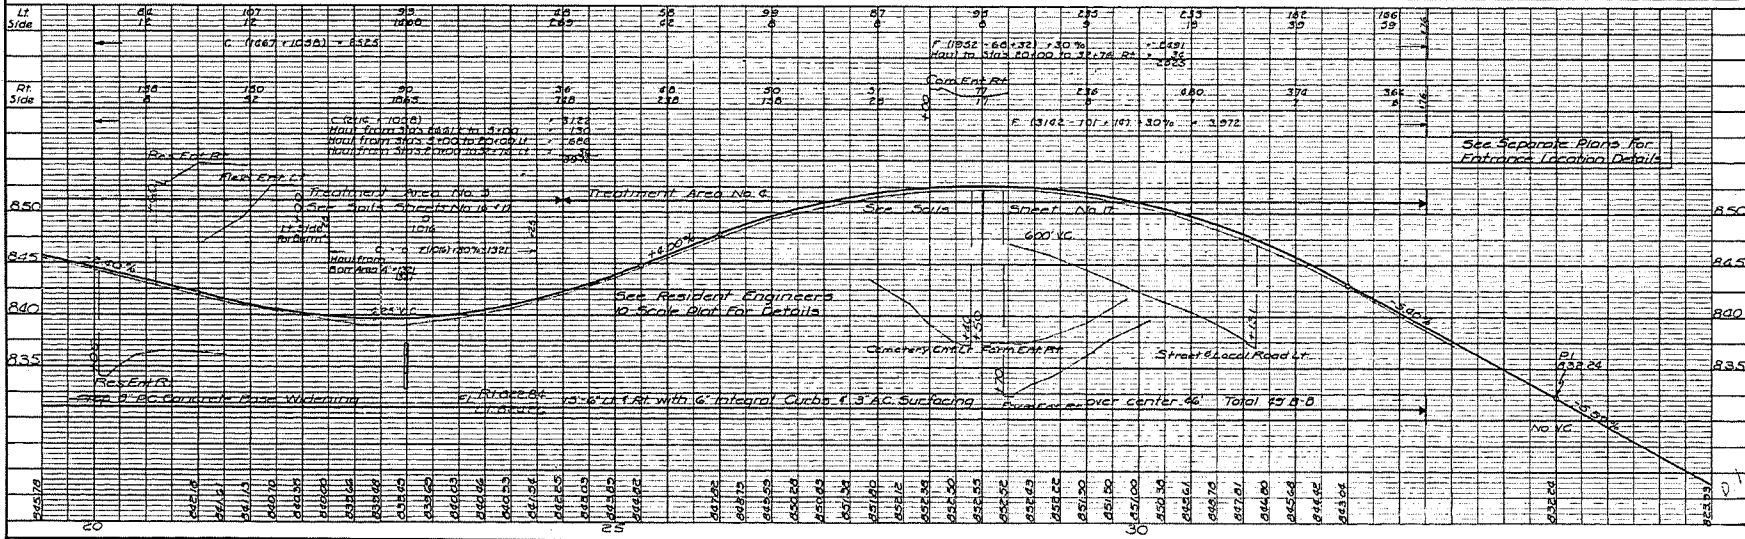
PLAN PROFILE OF P. R. & S. STANDARD
